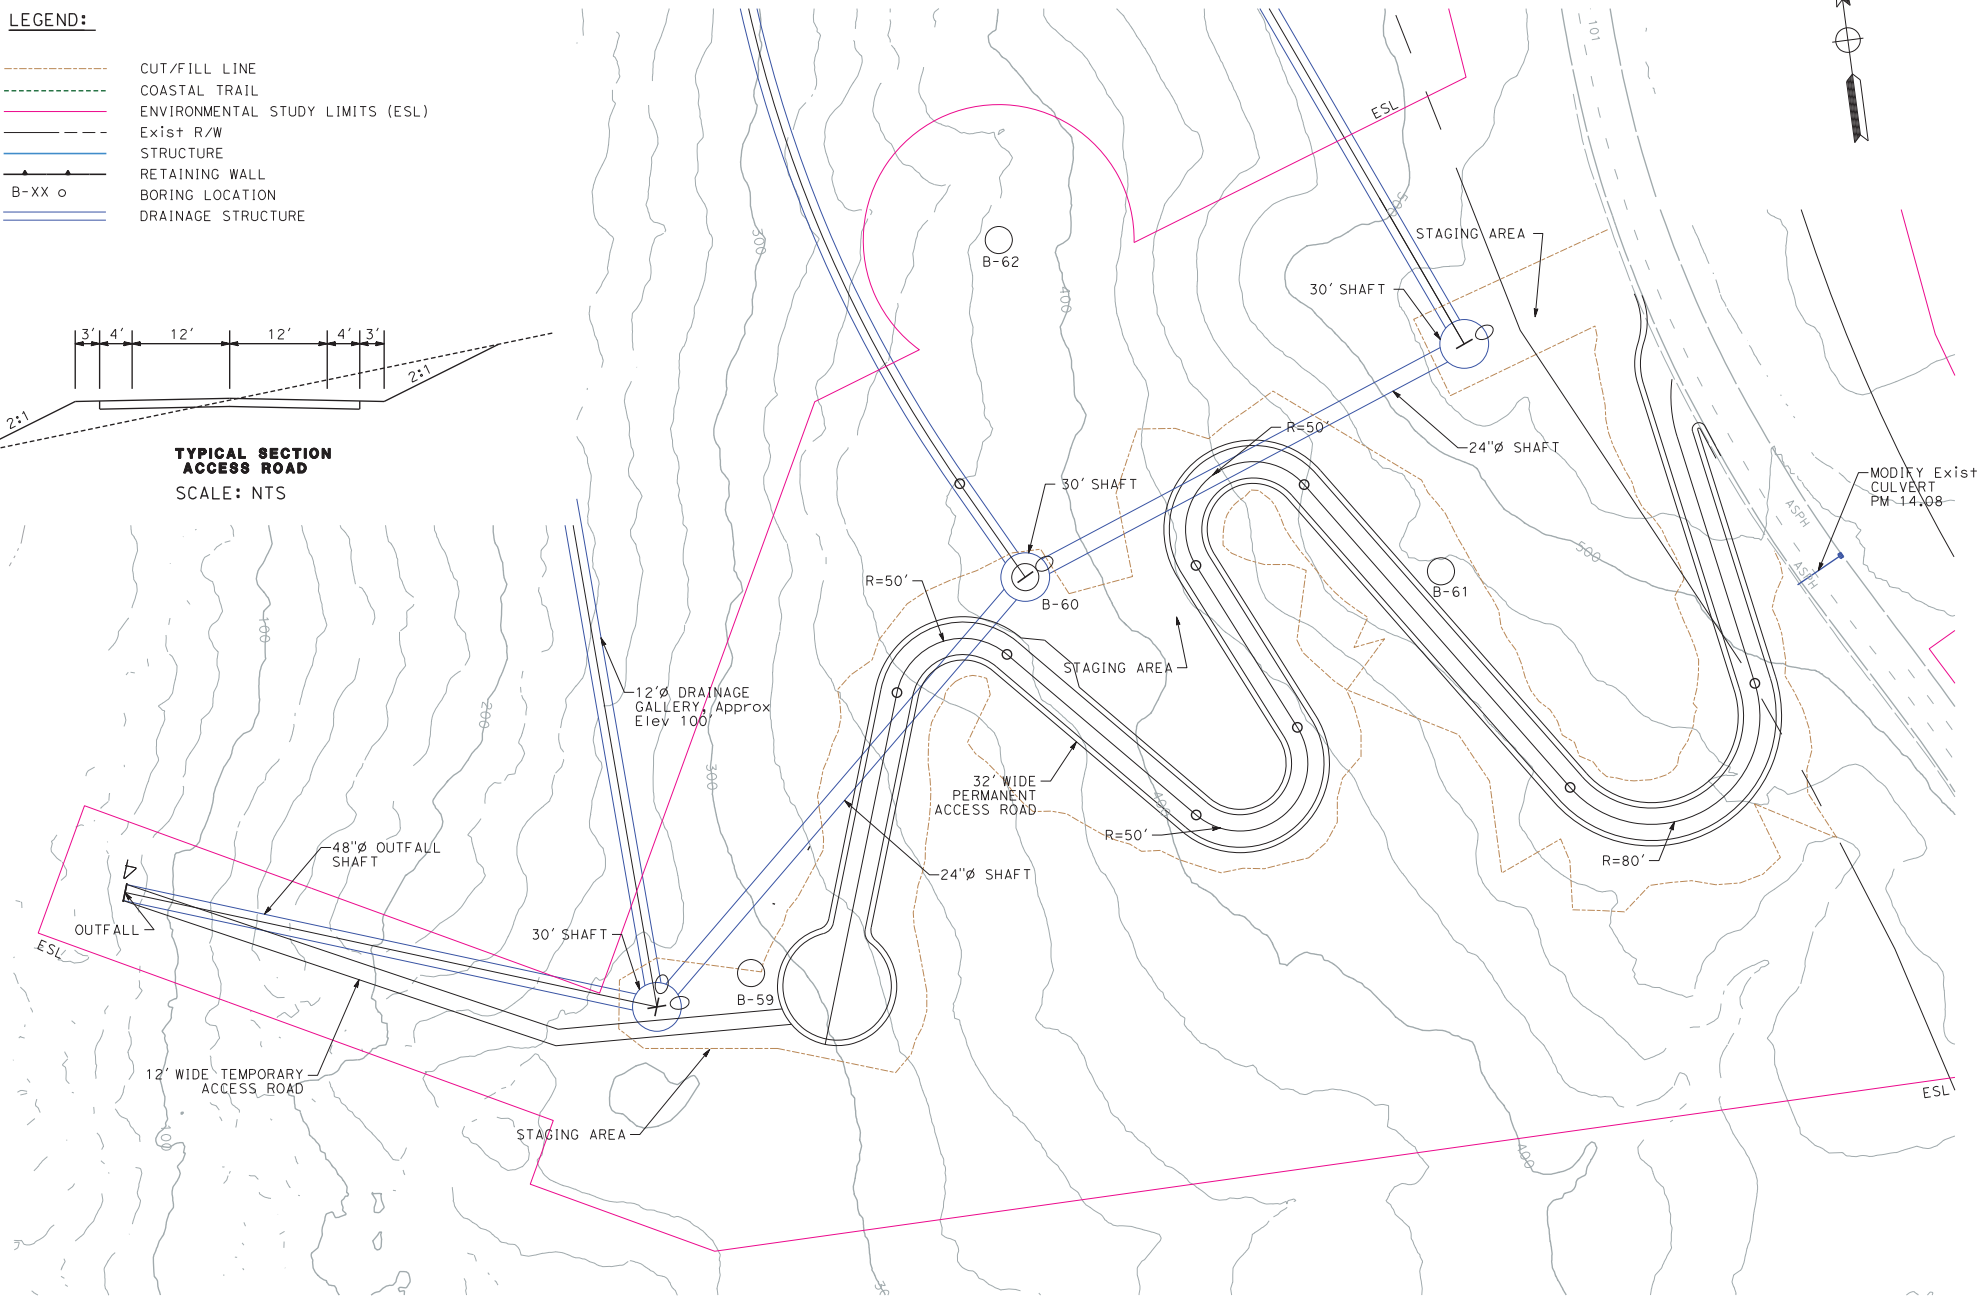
Alternative X Drainage Gallery Plan
